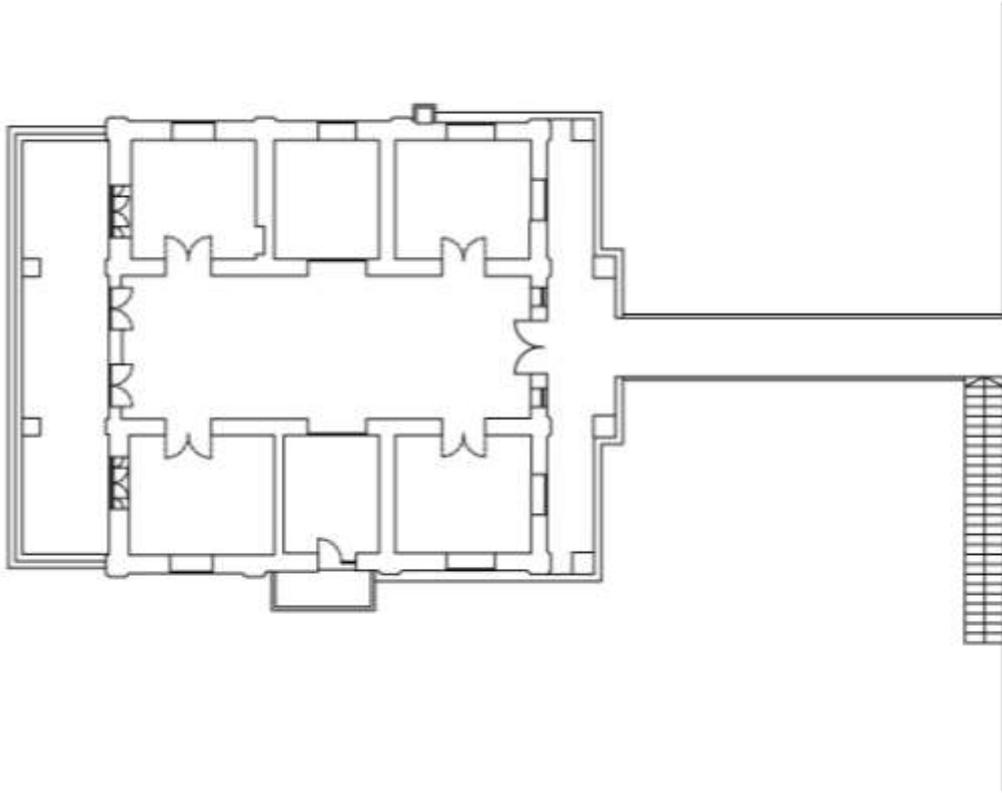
First (entrance) floor of the house at 63 lot 20 parcel
